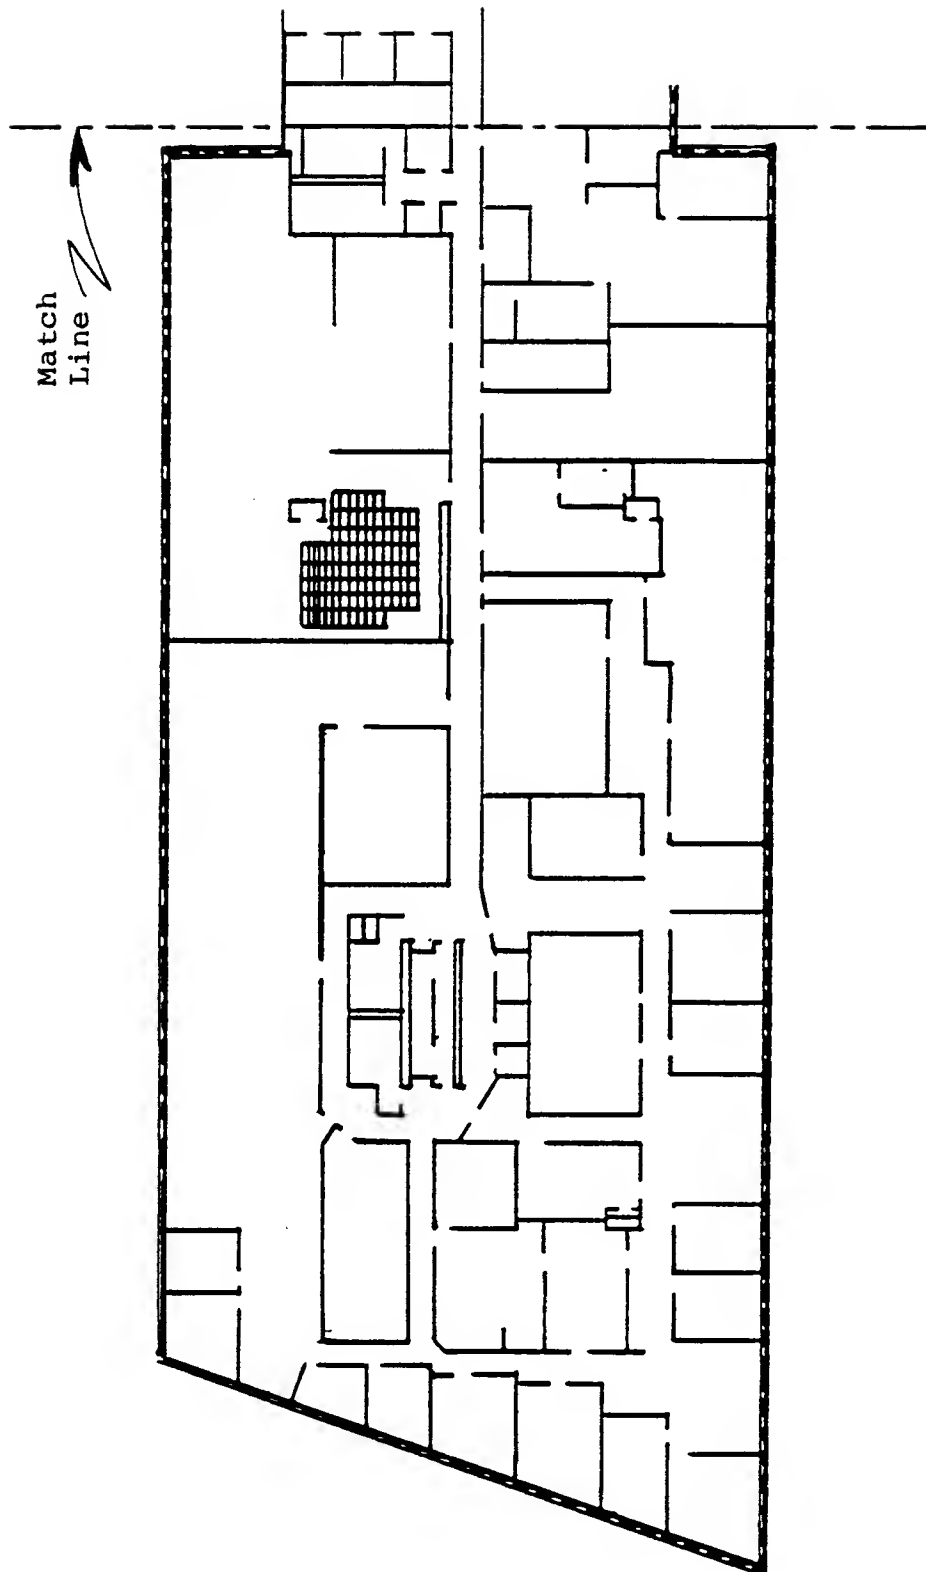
USIA BUILDING SIXTH FLOOR-SOUTH
